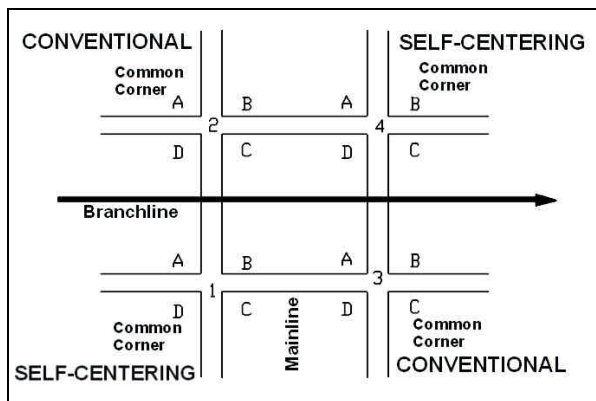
Crossing Diamond Test Fastener Layout at FAST
